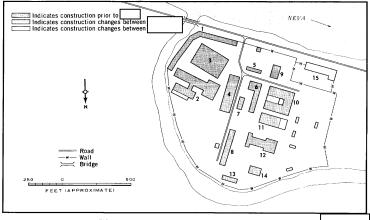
LAYOUT OF LENINGRAD AIRFRAME PLANT 272,
